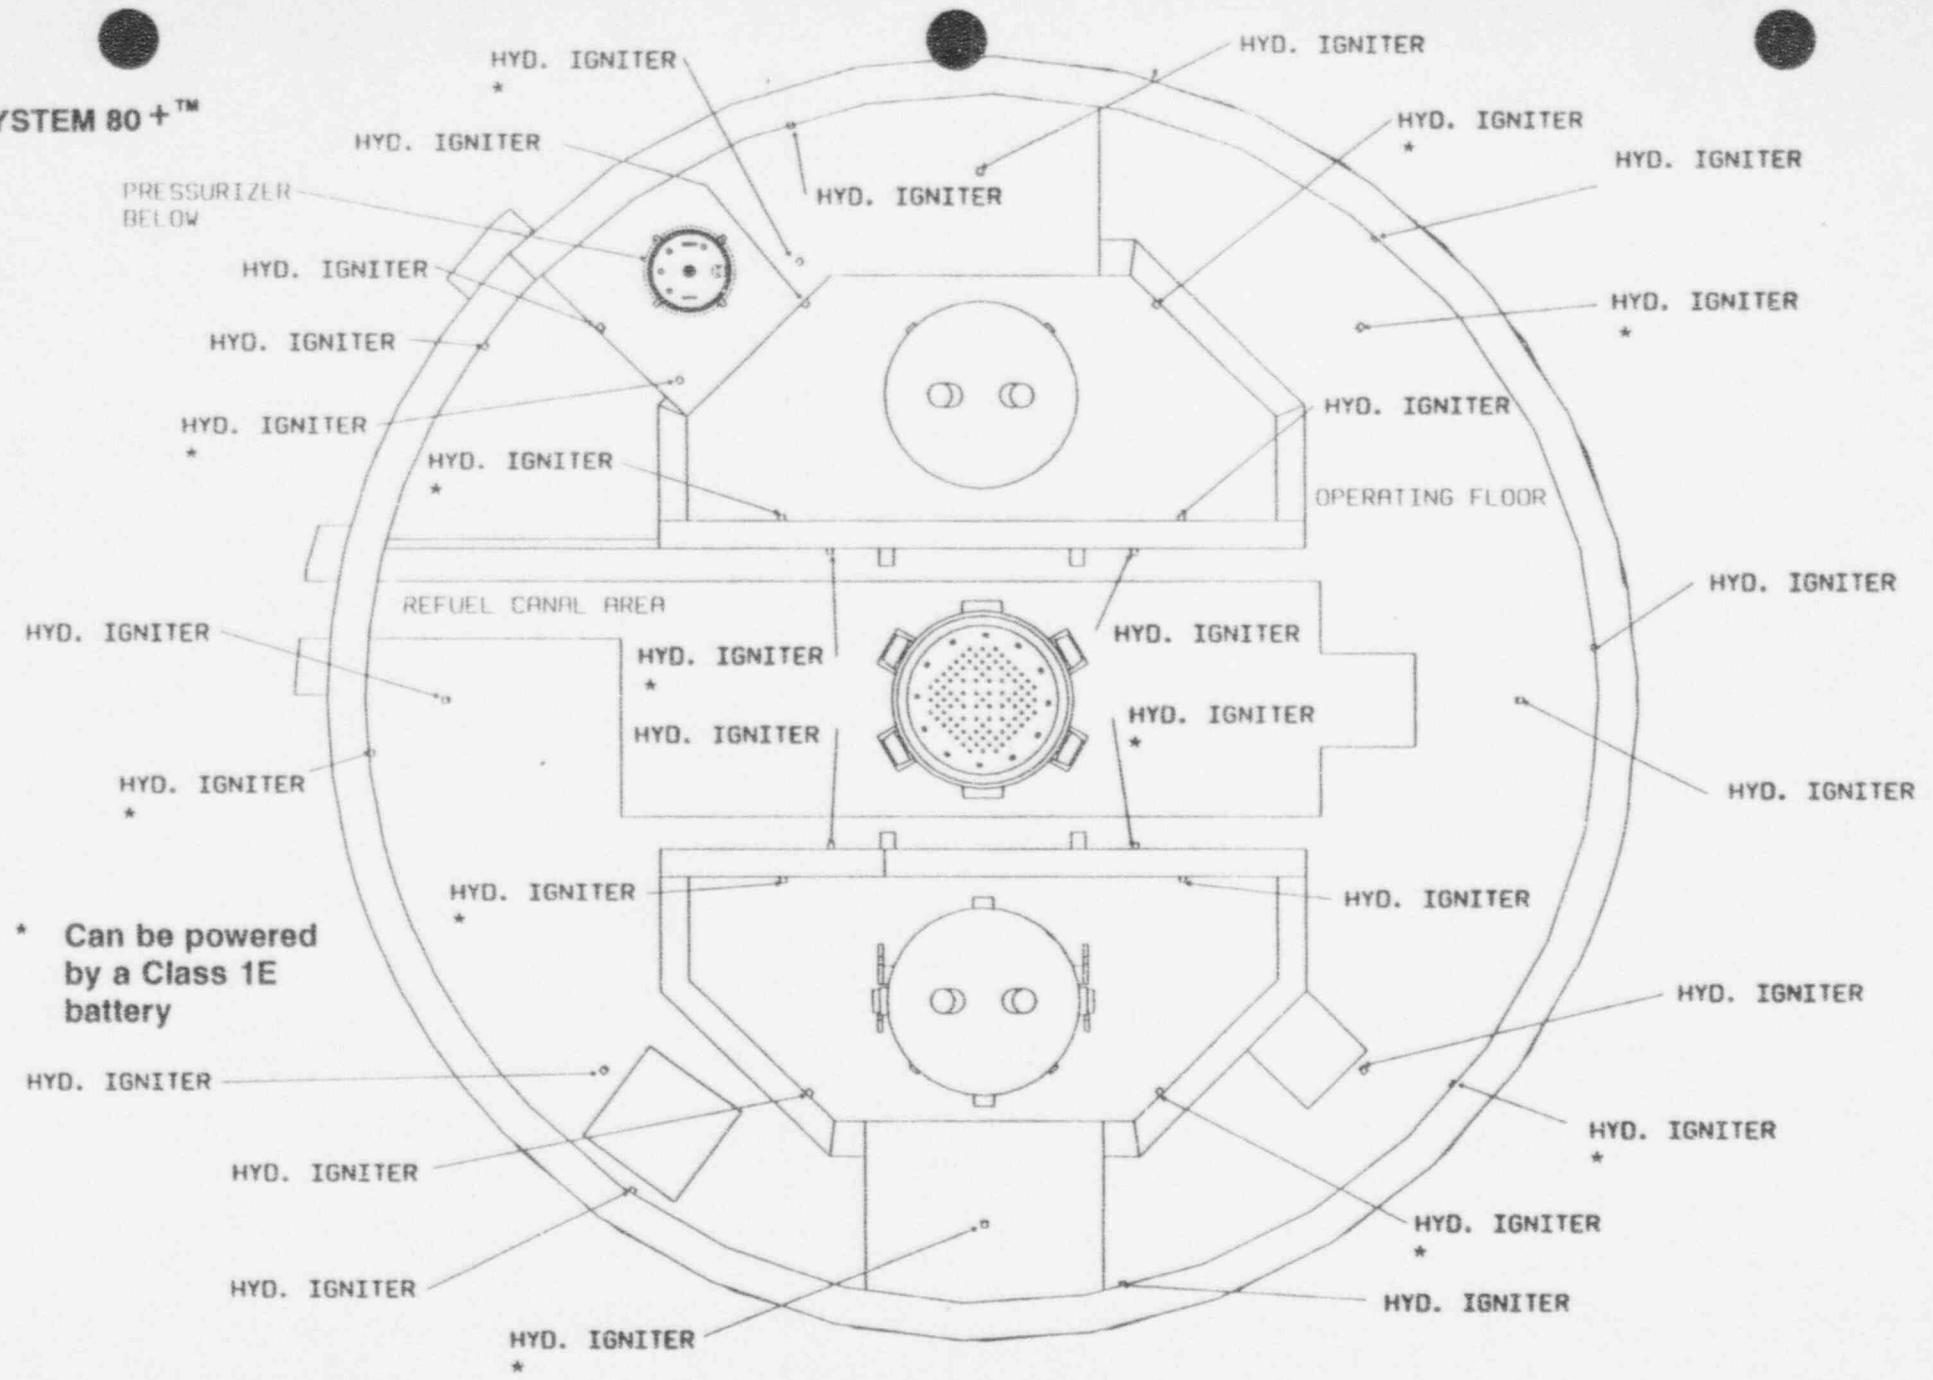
HYDROGEN IGNITER LOCATIONS: PLAN VIEW ABOVE ELEVATION 146+0 TO TOP OF DOME
